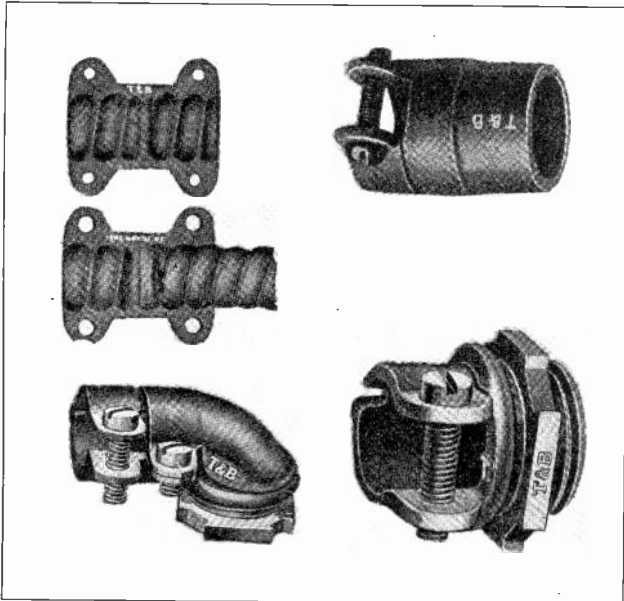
Several types of couplings used for connecting flexible conduit together or to outlet boxes.
